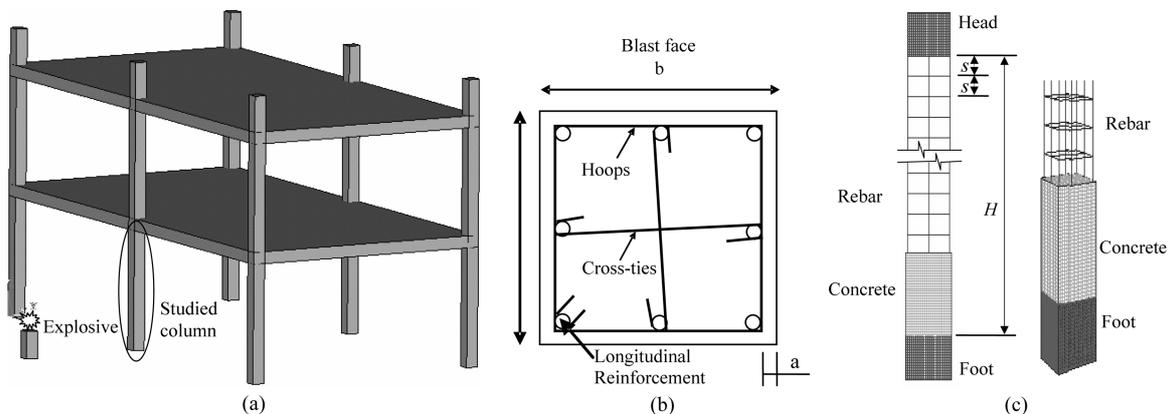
Numerical model of RC column (a) sketch of the field test; (b) column cross section; (c) detail of the rebar
